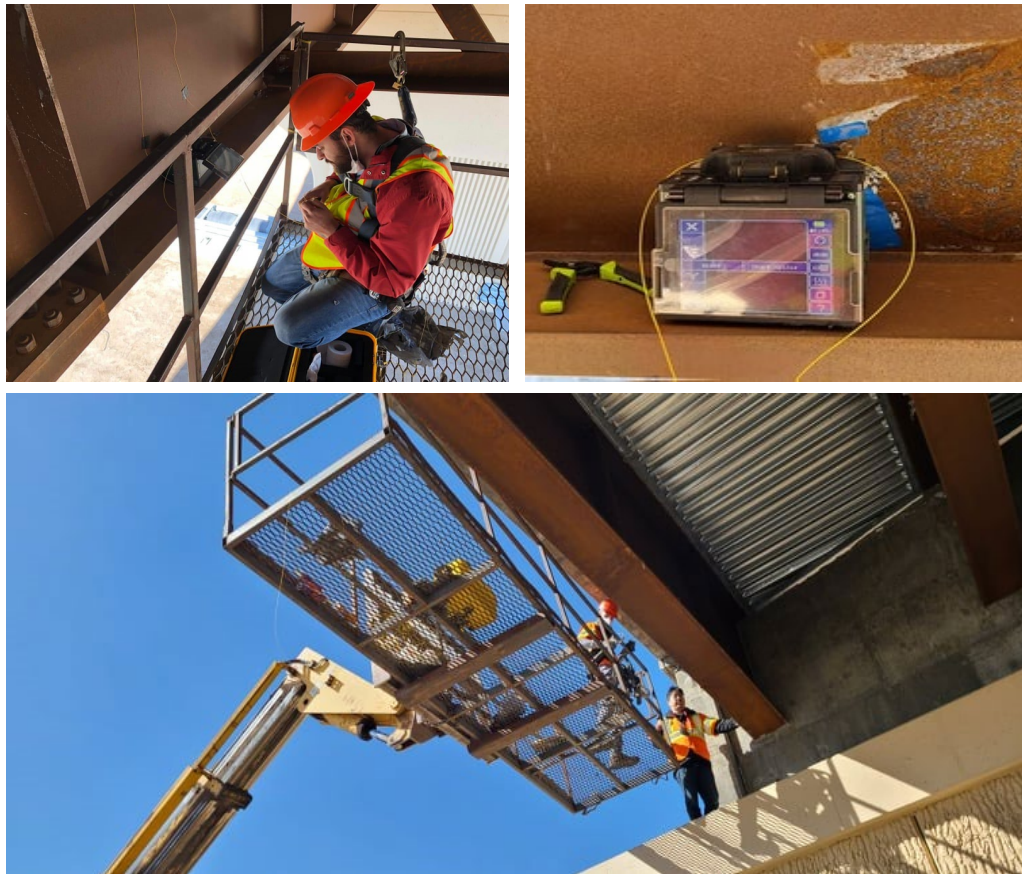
Performing Fiber Optic Cable Fusion Splice at the Girder Splice Point and Connecting Pigtails at the End of Each Cable
